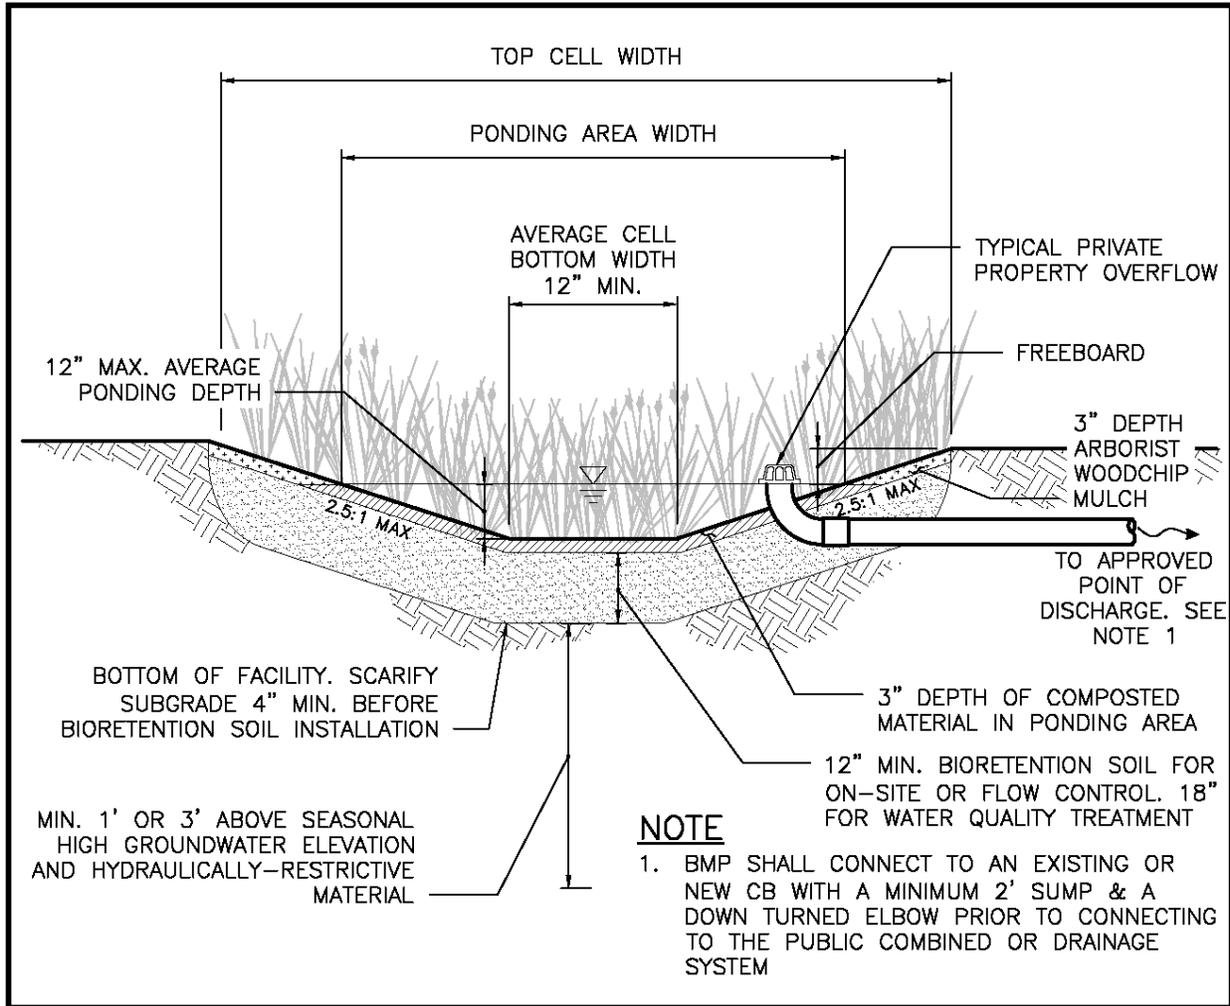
Infiltrating Bioretention Facility with Sloped Sides (without Underdrain).
